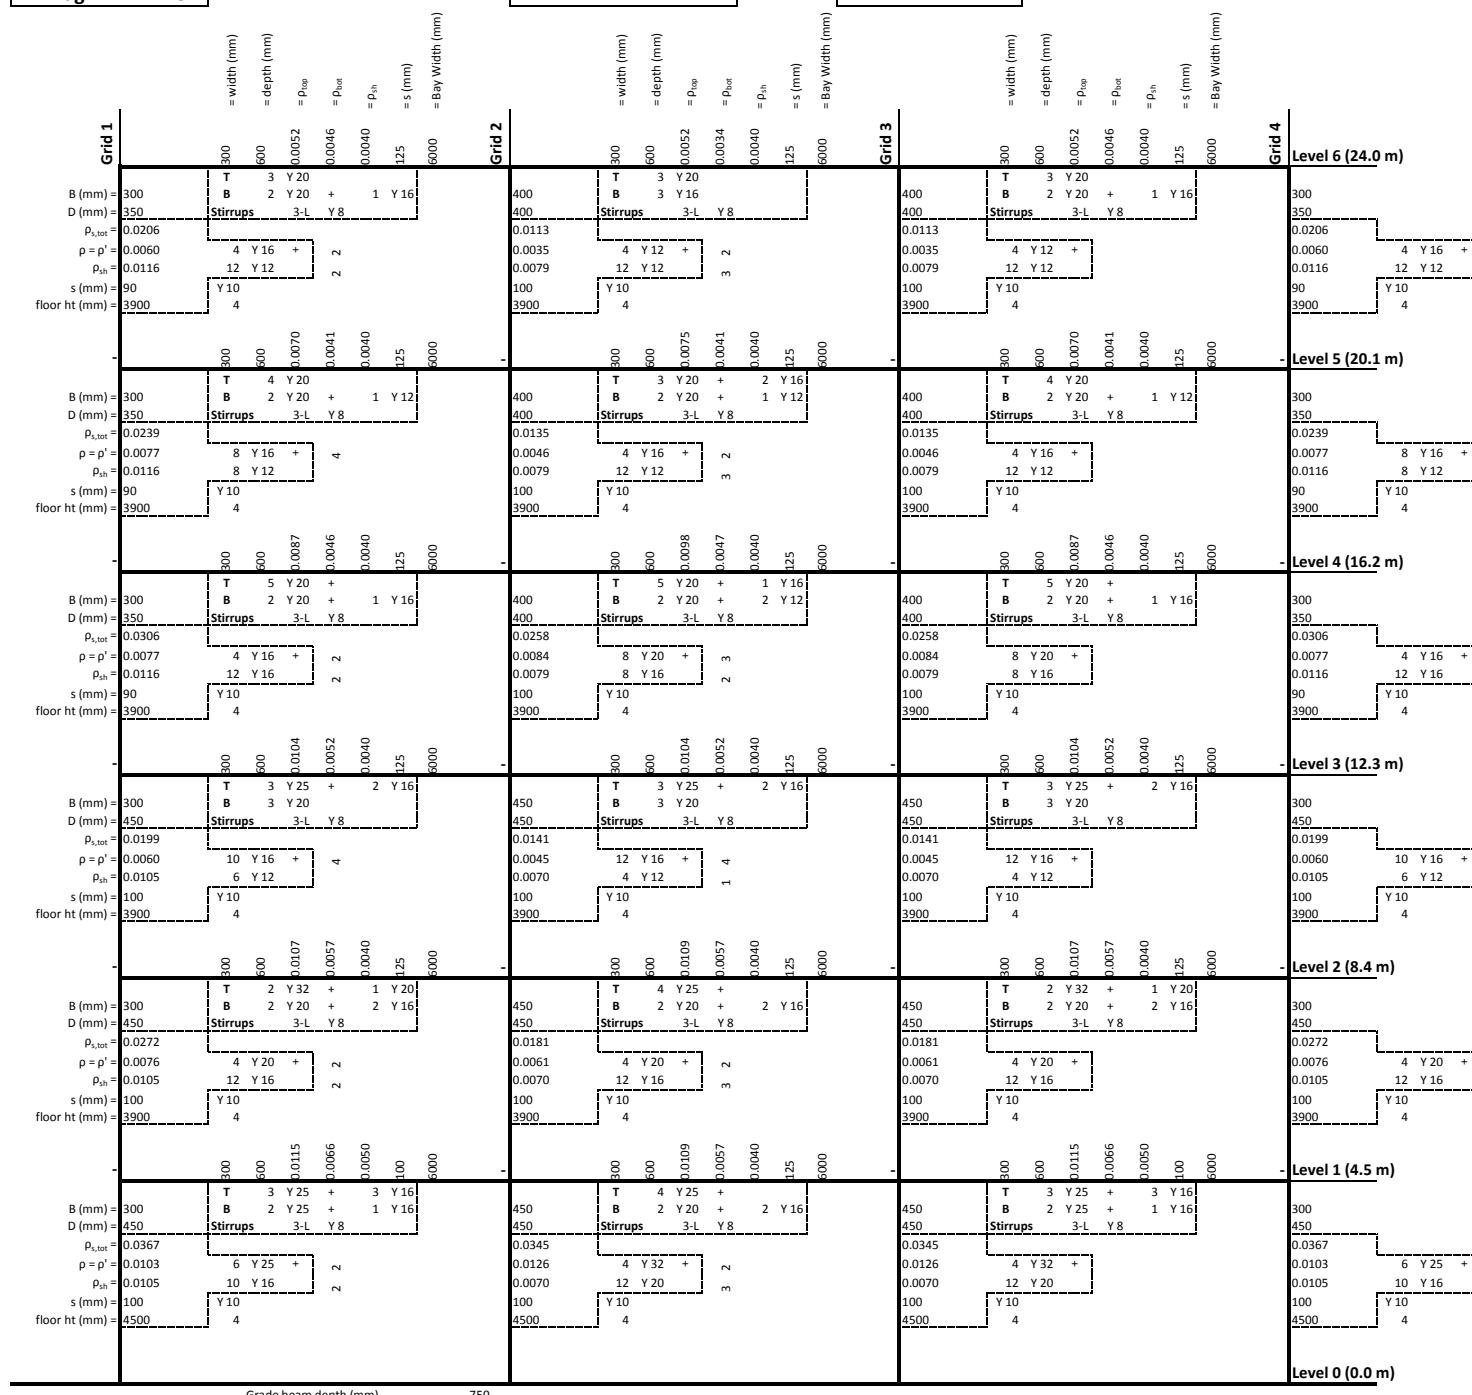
Provided reinforcement and modeling details for building ID 2443
